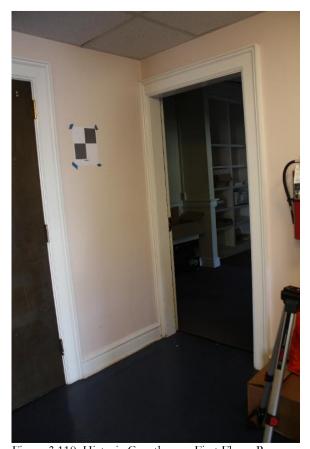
, Historic Courthouse, First Floor, Room 131, general view of southwest corner of room at entry to Room 122.
